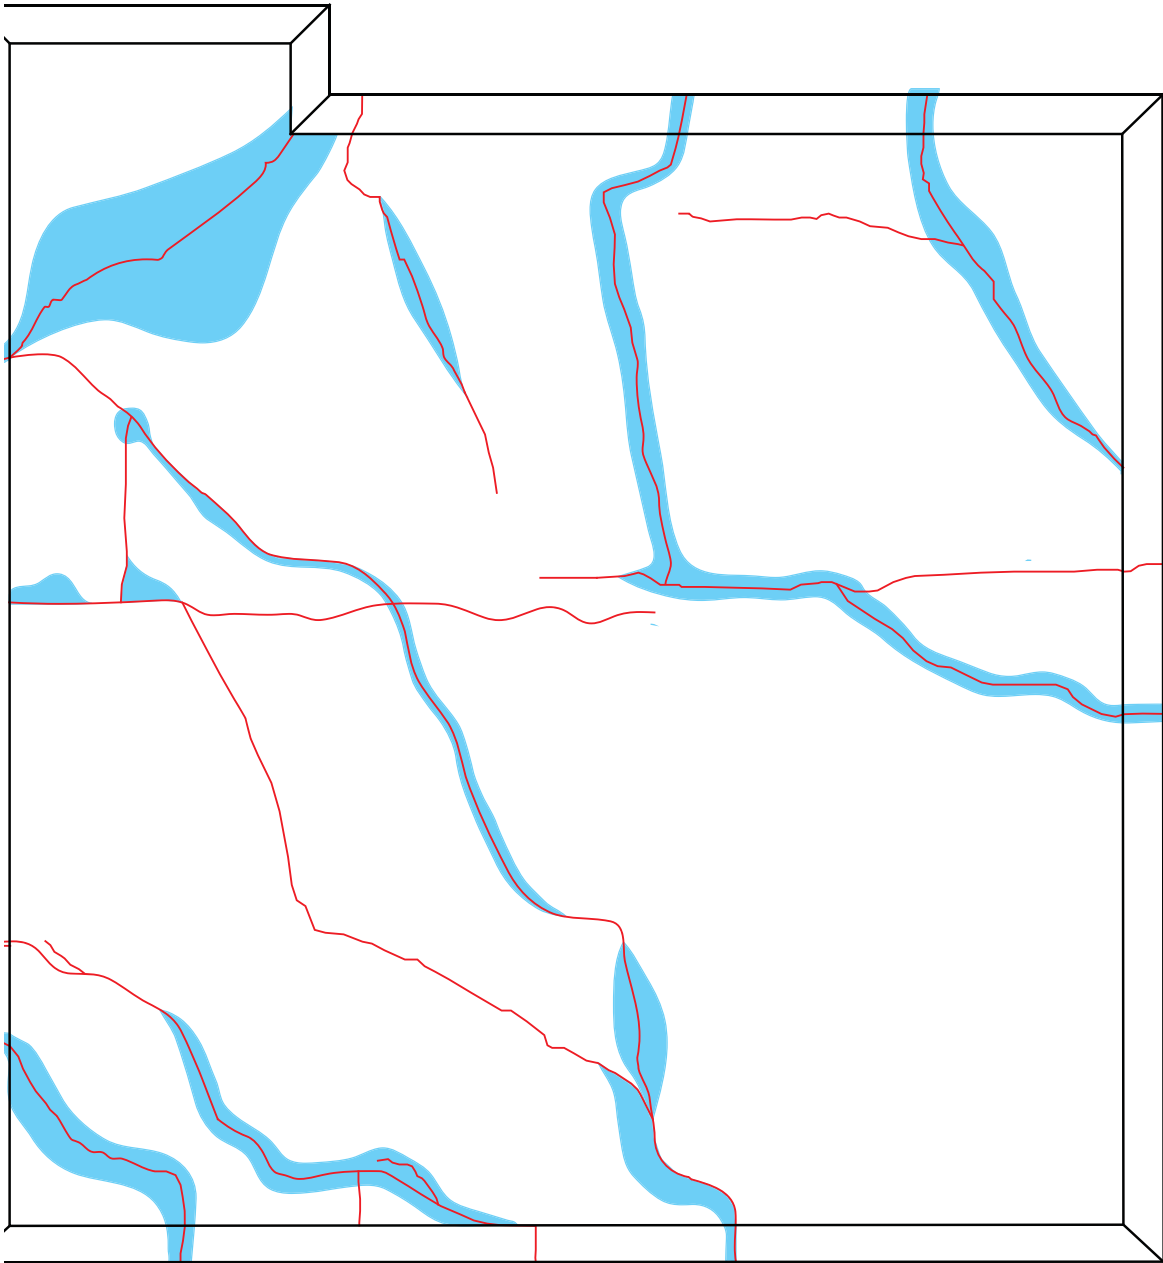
Exterior stucco, west elevation: Additional cracking not seen in visible light viewed in Infrared.
